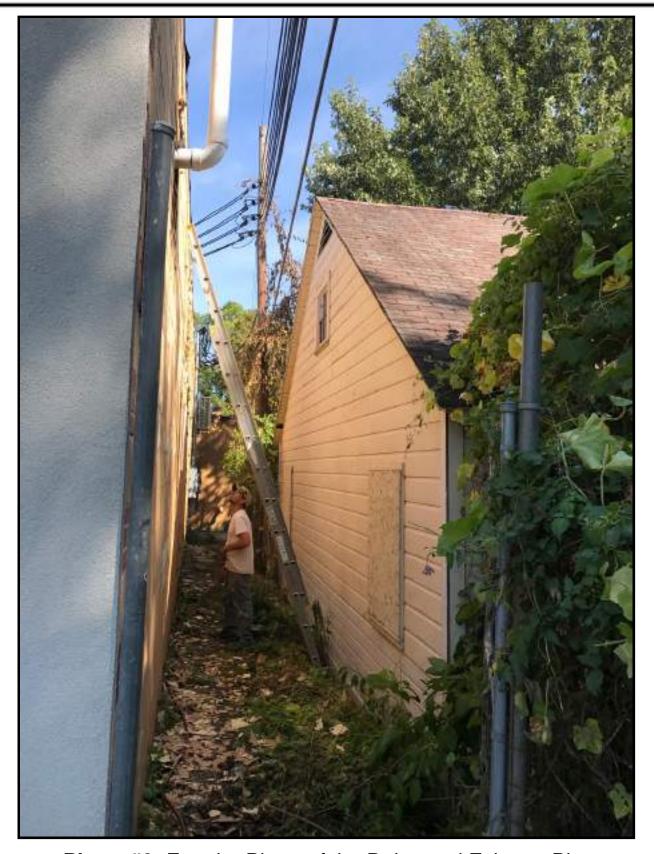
Exterior Photo of the Relocated Exhaust Pipe
